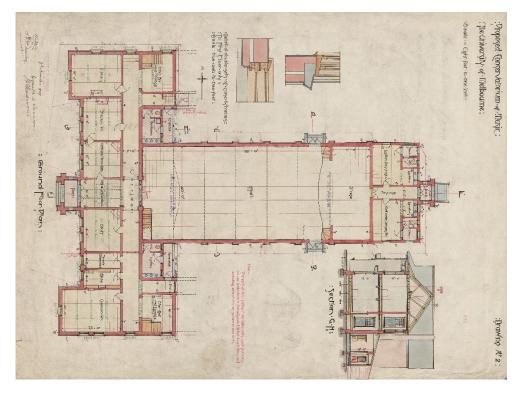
Contract Drawings for the construction of Melba Hall and the first Stages of the Conservatorium. Note the original layout of Melba Hall with a proscenium wall not realised.
